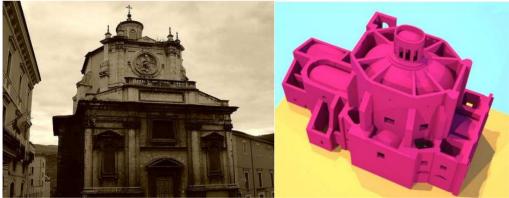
Sant'Agostino church: (a) baroque façade, (b) 3D geometric model.
